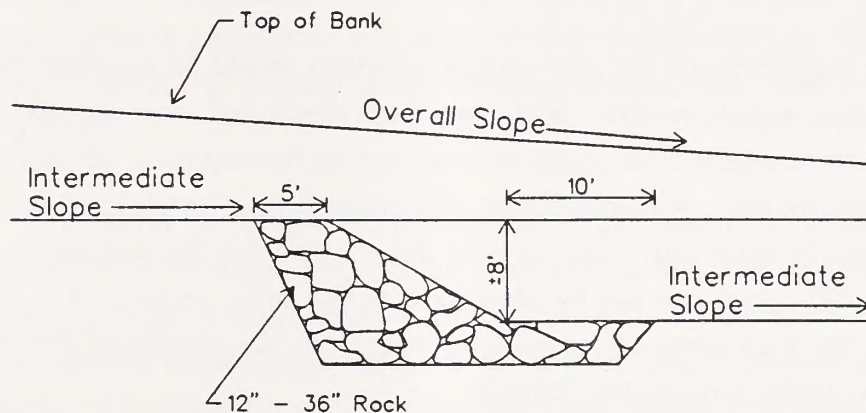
General Design of the Diversion Ditches Around the Heap Leach Facilities
